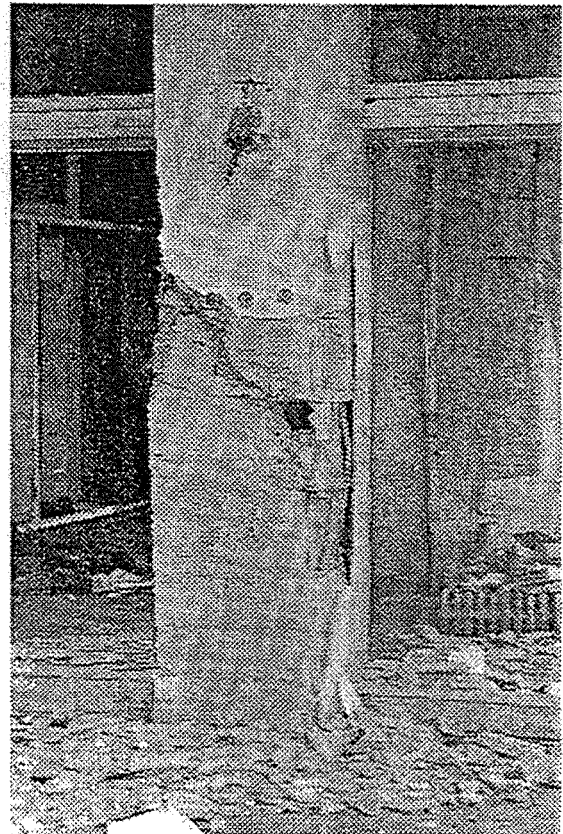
Shear failure in a column of building(Erzincan Earthquake[J3])
